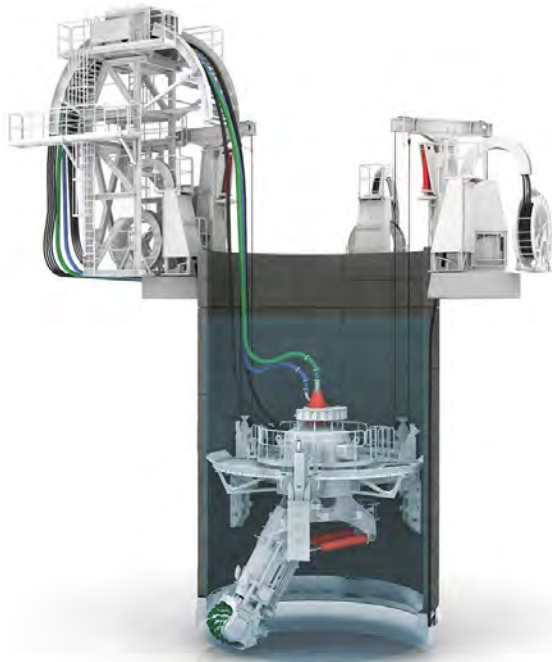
Herrenknecht AG Vertical Shaft Sinking Machine (VSM)
